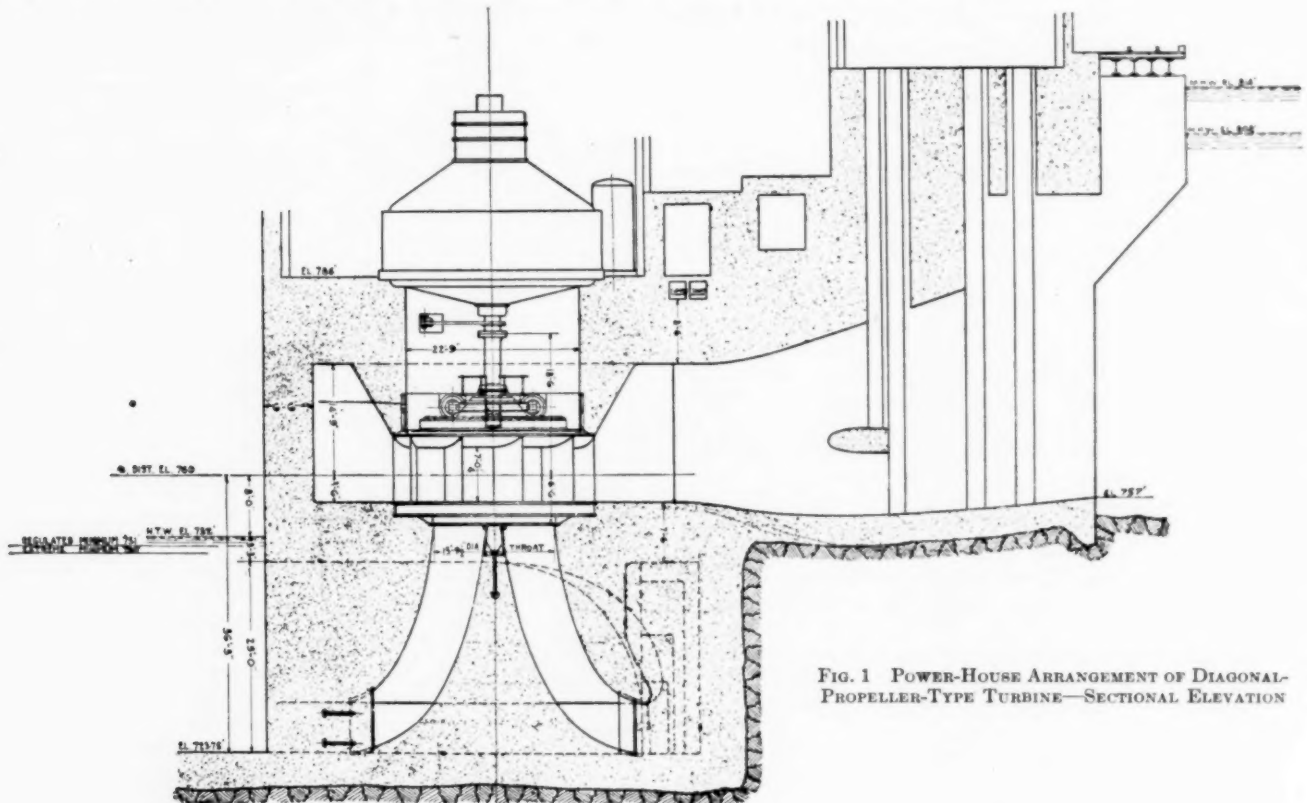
POWER-HOUSE ARRANGEMENT OF DIAGONAL-PROPELLER-TYPE TURBINE—SECTIONAL ELEVATION
